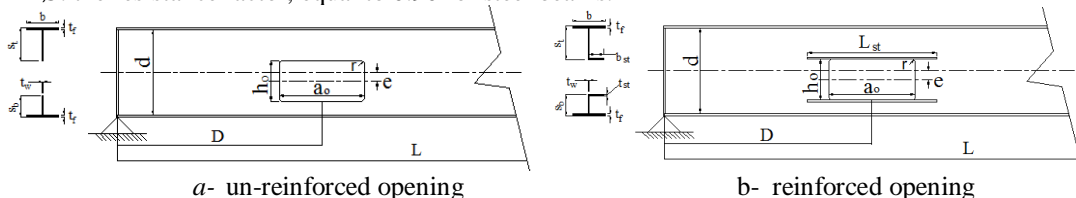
Dimensions of un-reinforced and reinforced opening in steel beams according to Darwin guidelines^[11]
